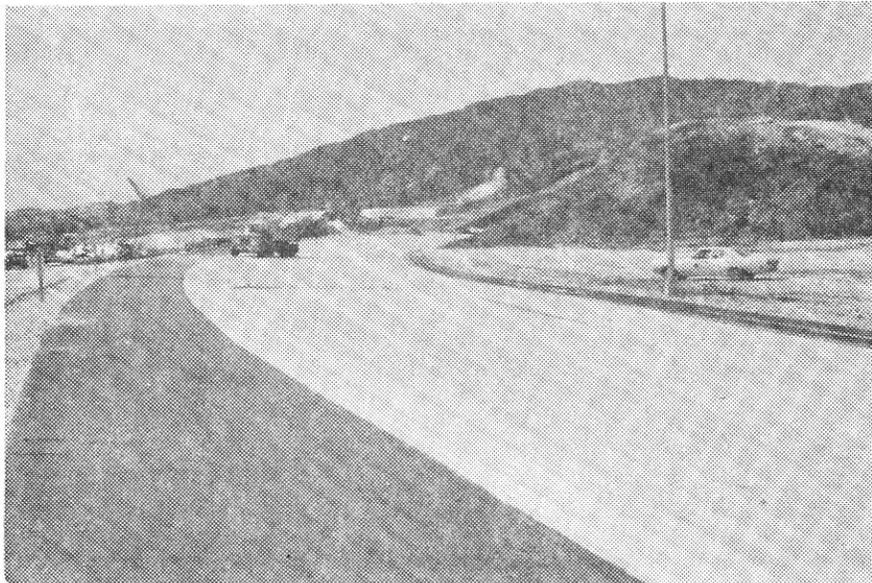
Looking northwesterly at pavement slab displacement through cut/fill zone on Connector C-Y.
